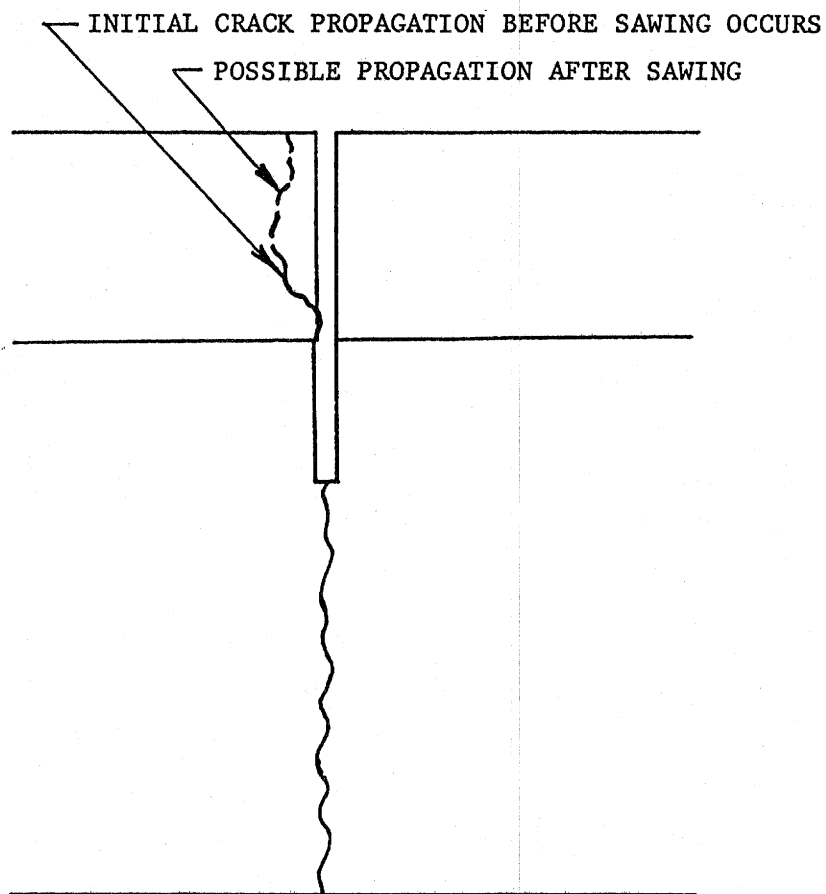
Development of secondary joint cracking in bonded concrete overlays when the overlay joint is not sawed prior to crack propagation past the adjustment point.
